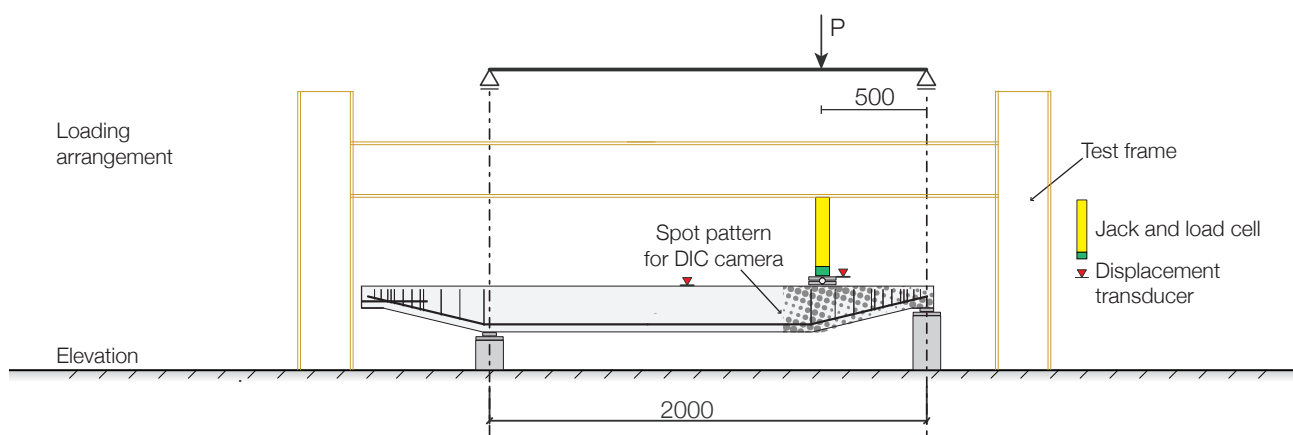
Typical test set up, Beams 9\_2\_STM(i) and 9\_2\_STM(ii).
